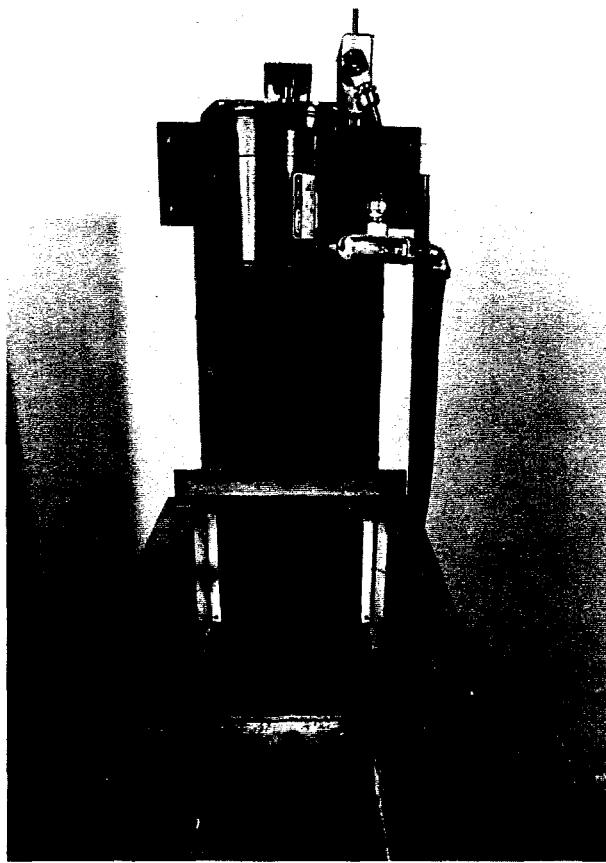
Upstream view showing vertical sliding head-gate and reversible electric motor operator.
